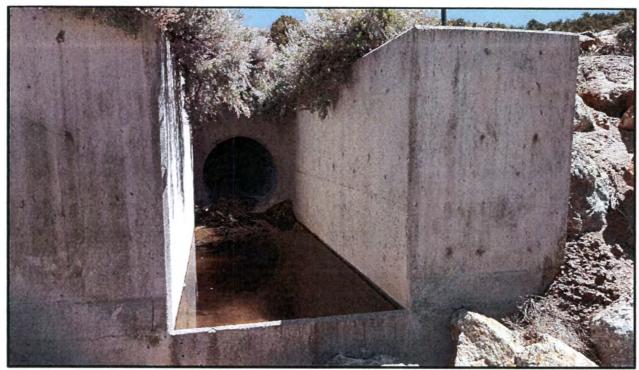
Looking east at the drop structure outlet. Note minor sediment buildup and bushy vegetation beginning to take root.
